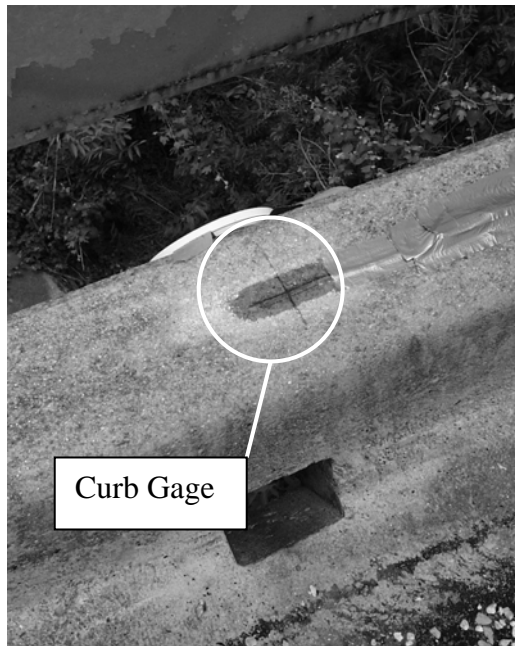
Curb Gages – Lake LBJ Bridge
